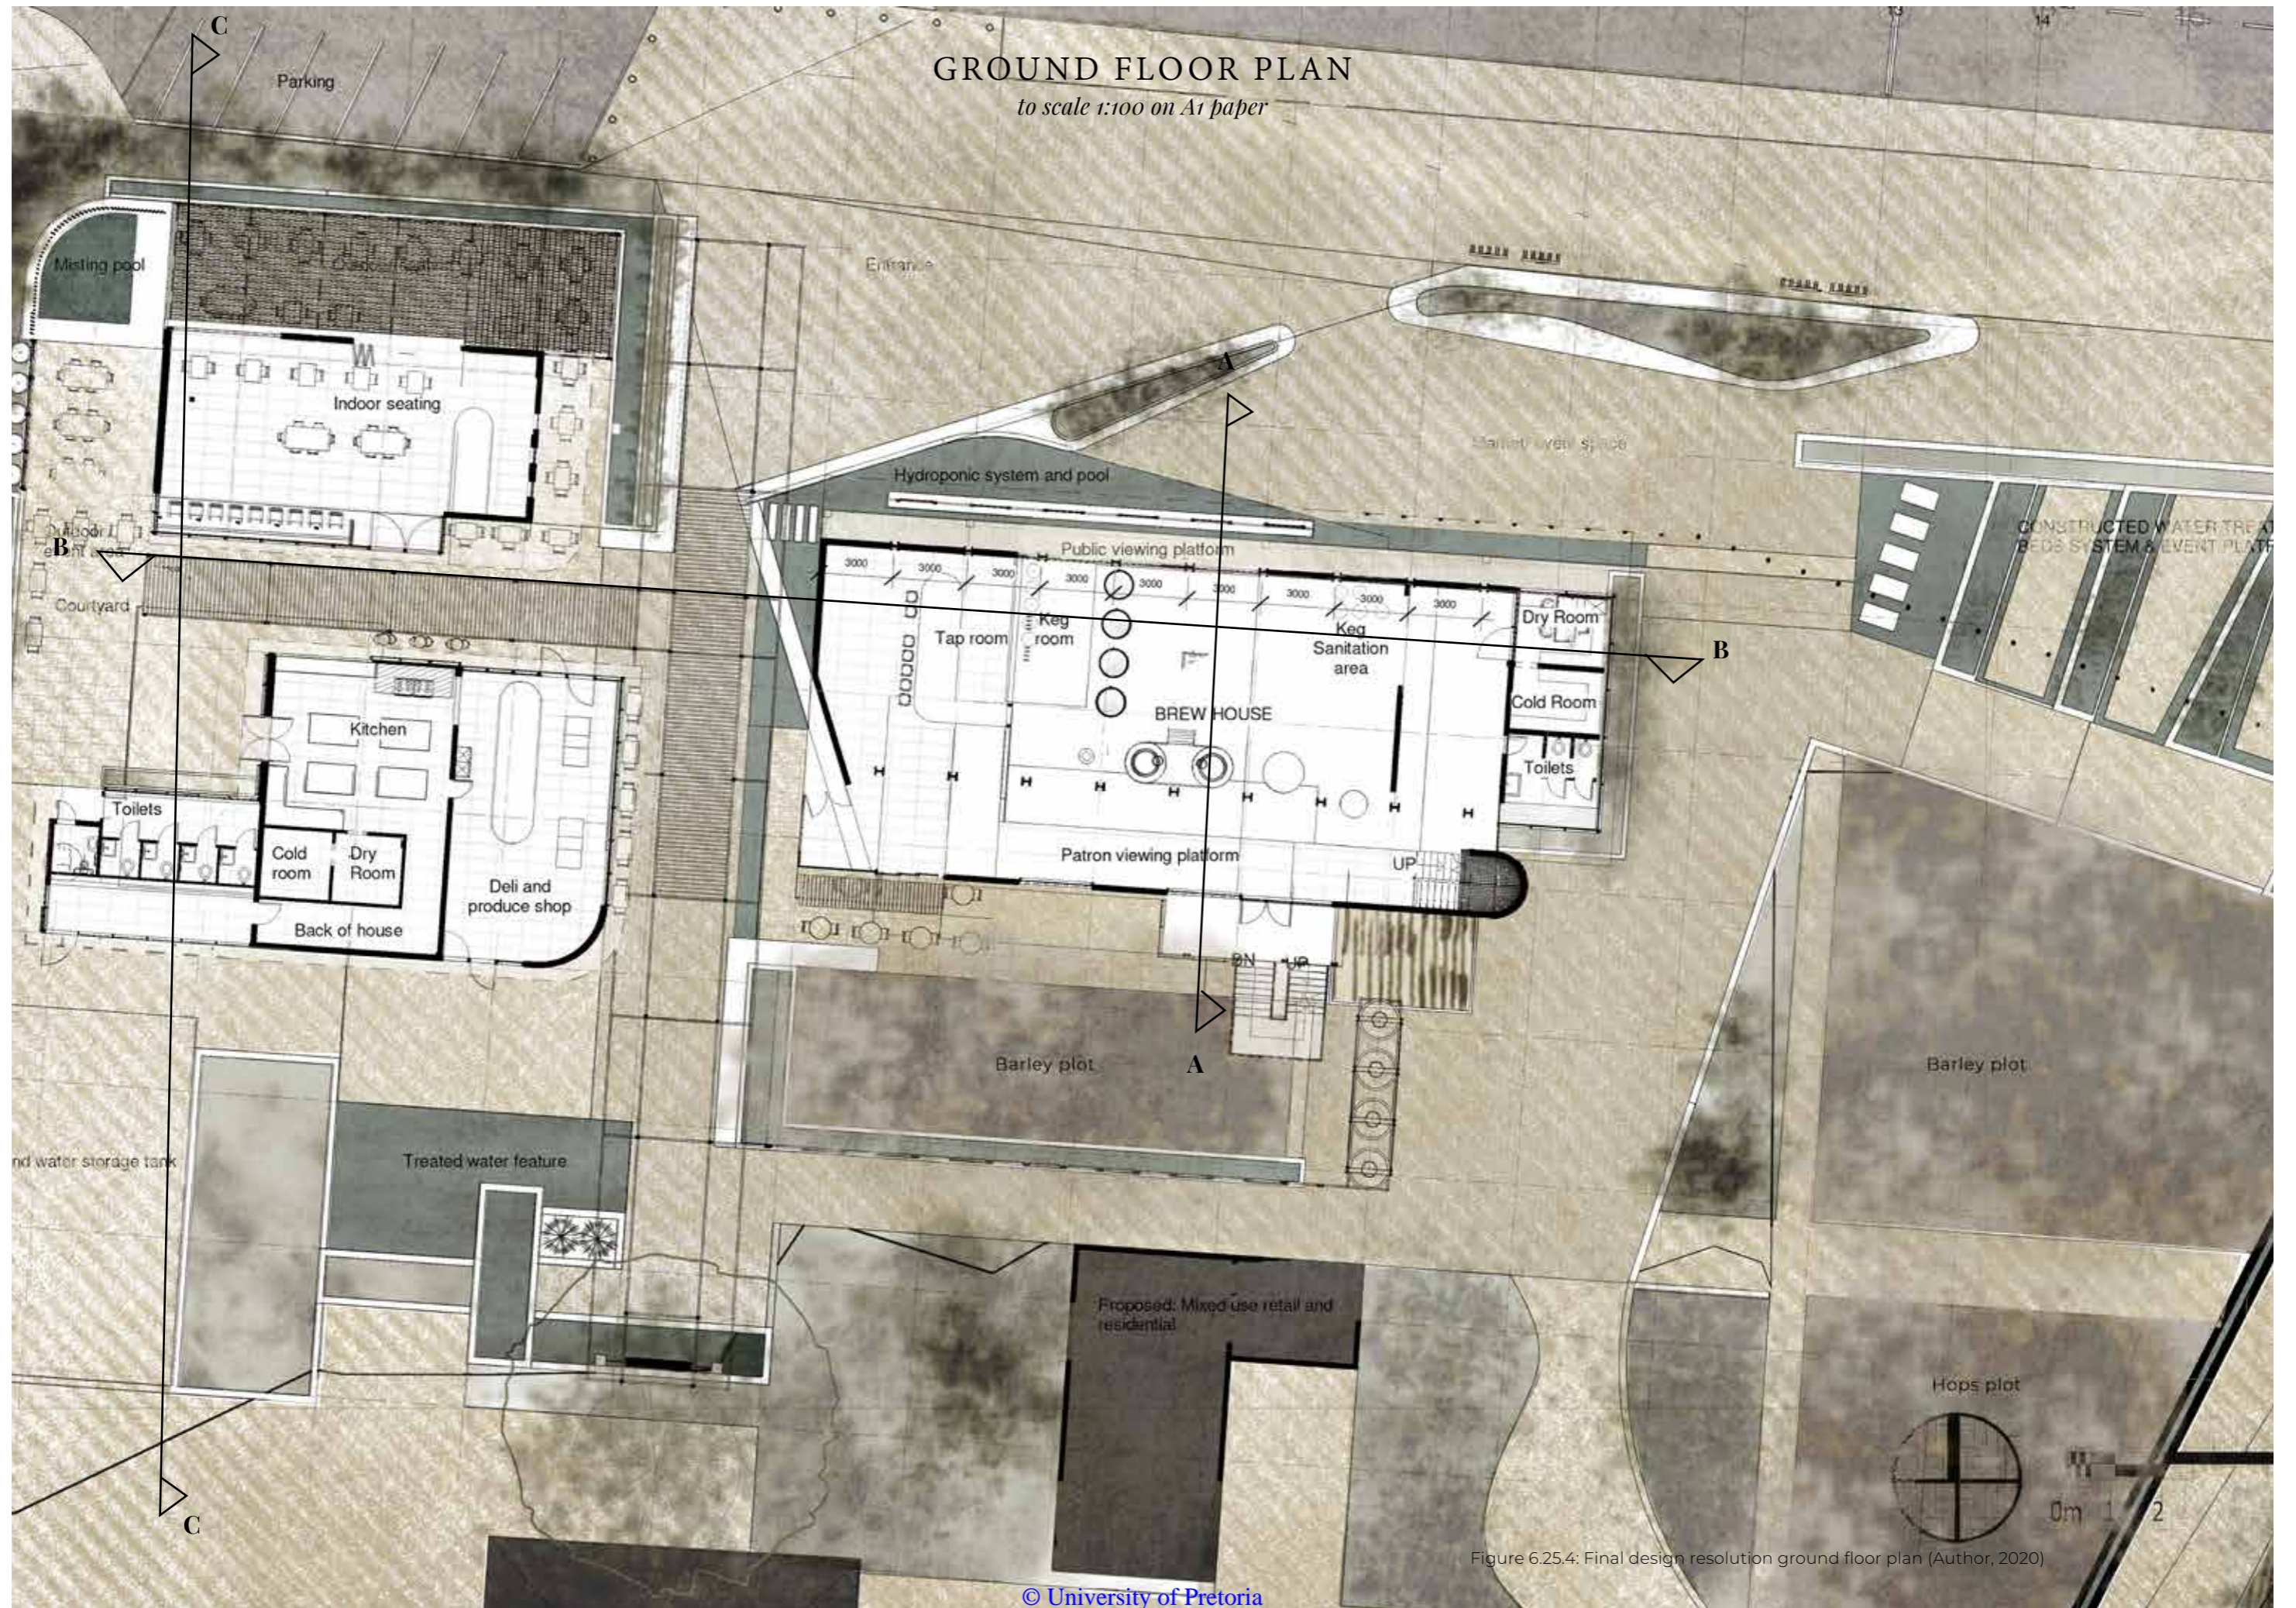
Final design resolution ground floor plan (Author, 2020)
